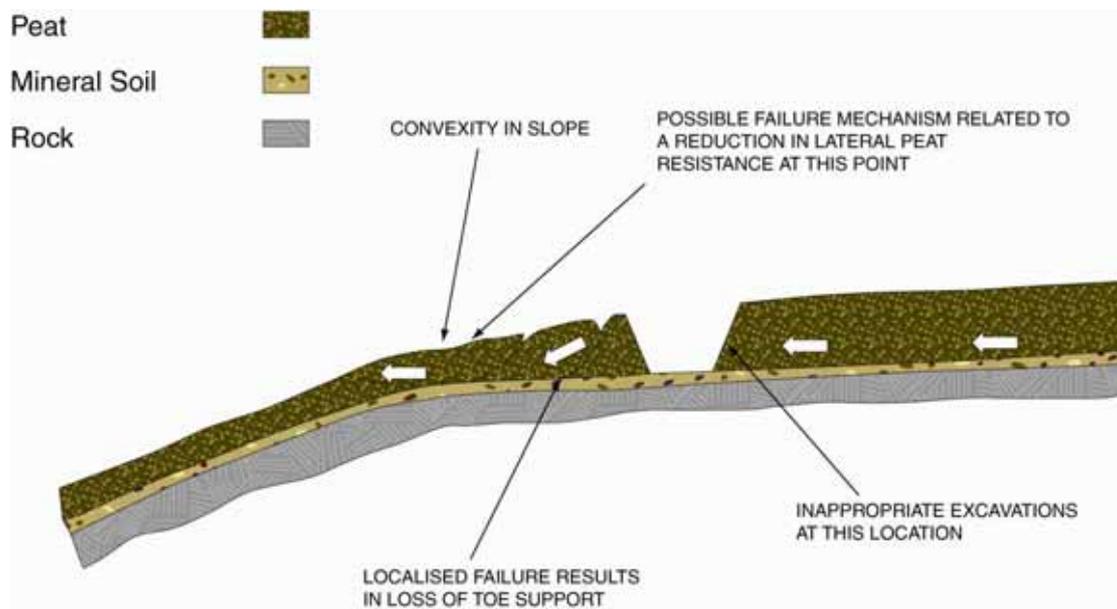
; Typical failure due to excavation adjacent to convex slope.
